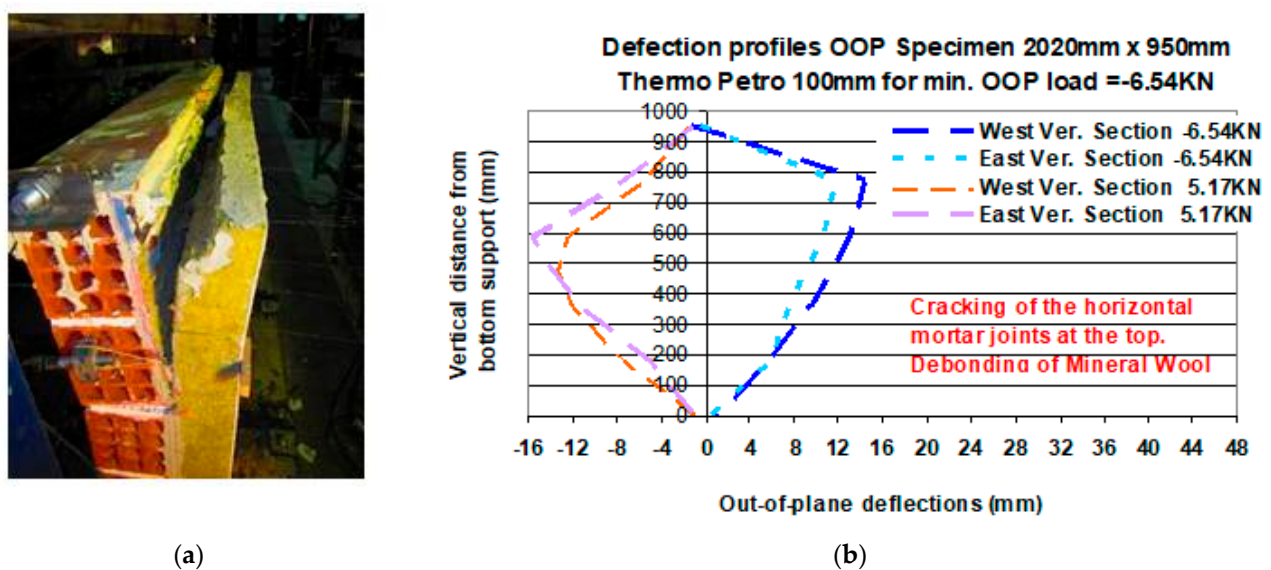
(a-left) Masonry wallet with mineral wool attachment propagation of crack pattern and debonding of mineral wool. (b-right) East and West vertical cross-section out-of-plane horizontal displacement profiles for certain distinct stages of the out-of-plane horizontal load applied to the masonry wallet with mineral wool thermo-insulating attachment.
